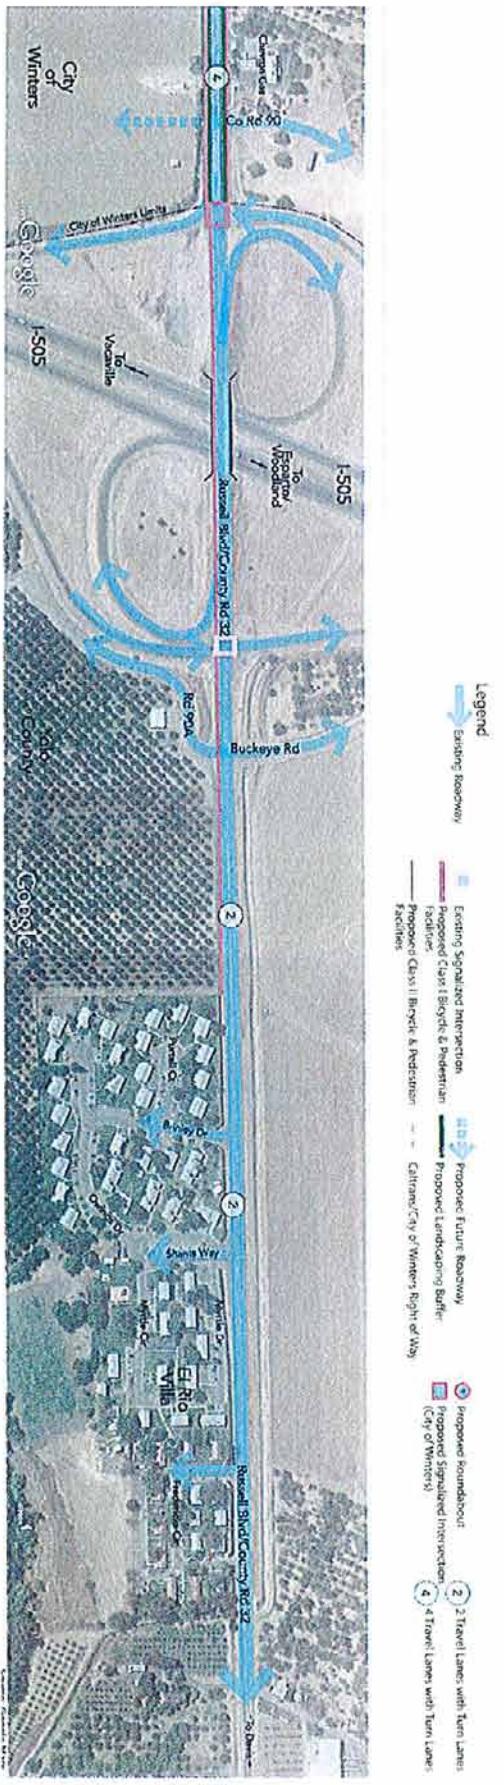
PLAN VIEW OF COMPLETE STREETS CONCEPT
